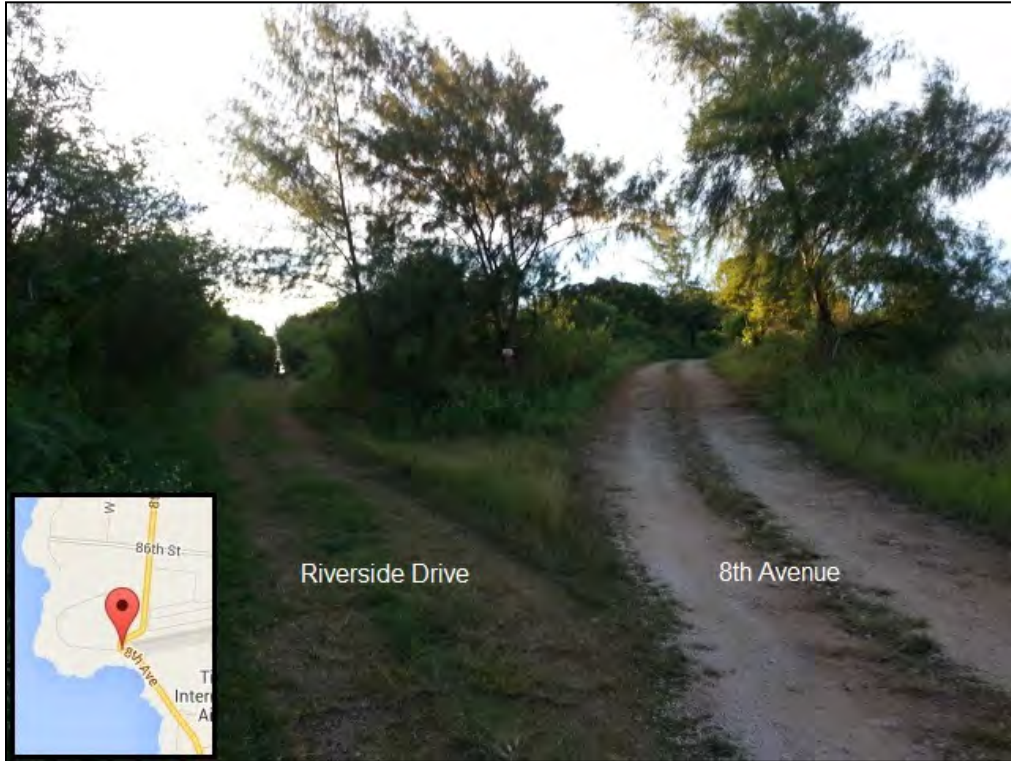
Riverside Drive at 8th Avenue, Facing Northwest
